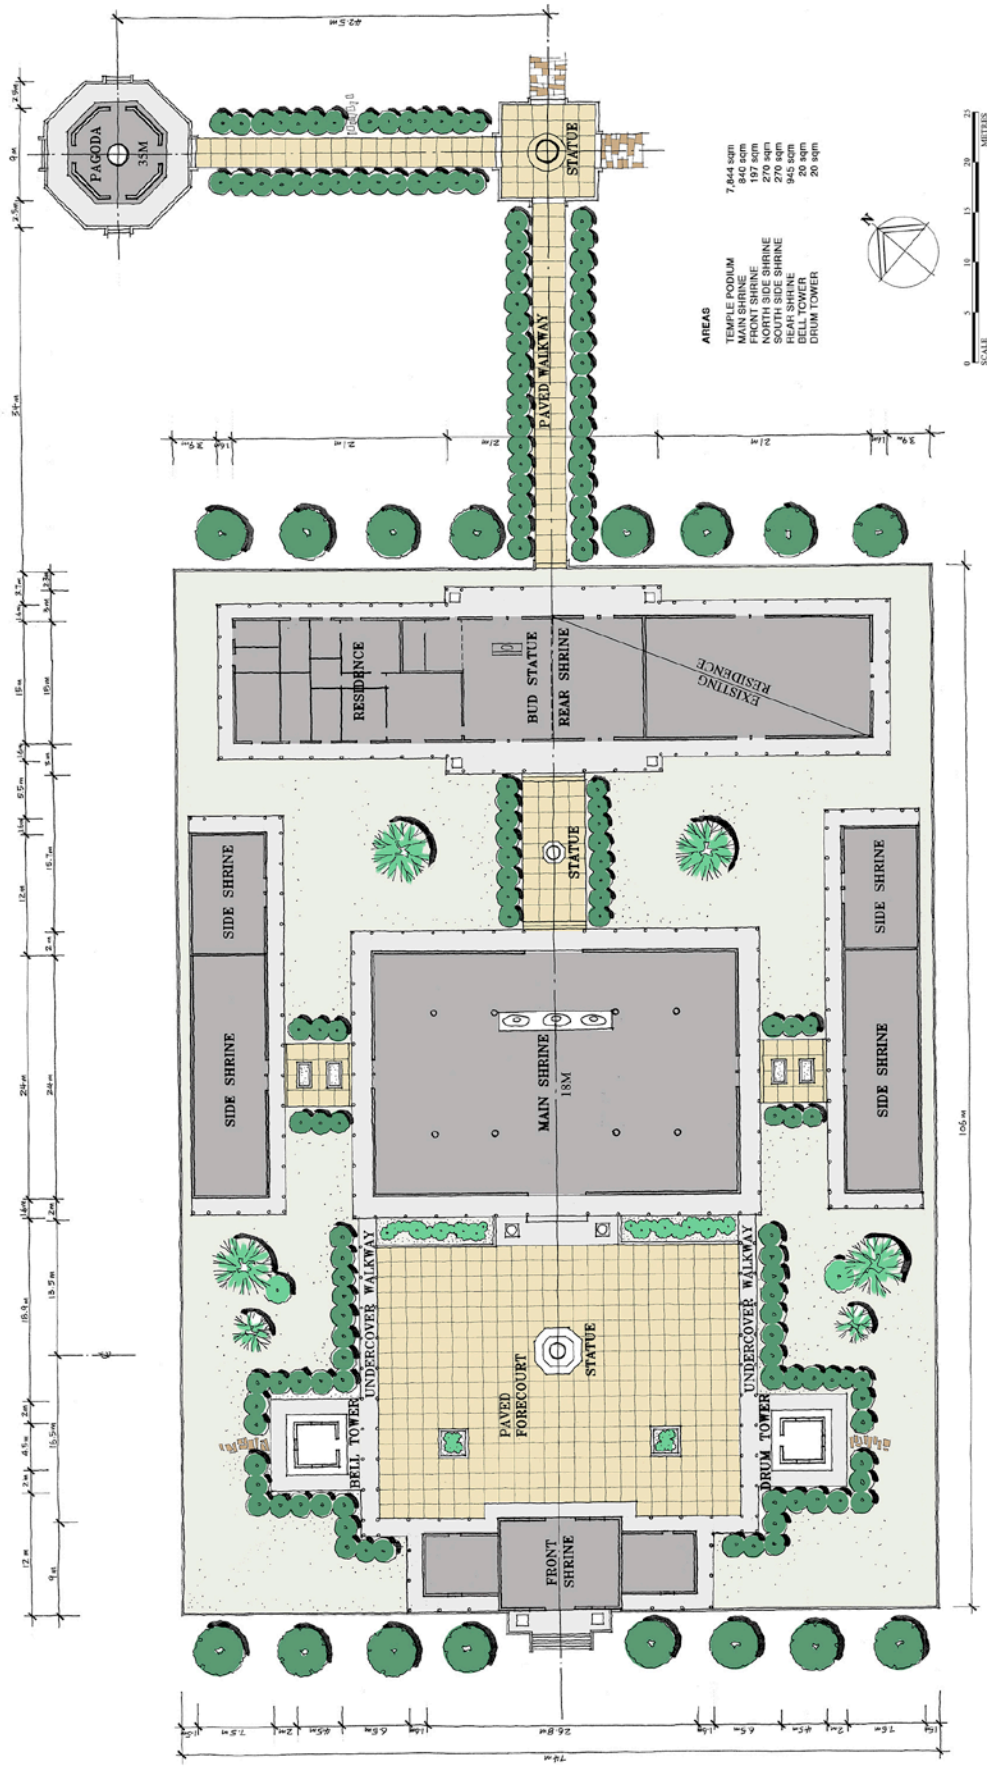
Nan Hai Pu Tuo Temple floor plan
